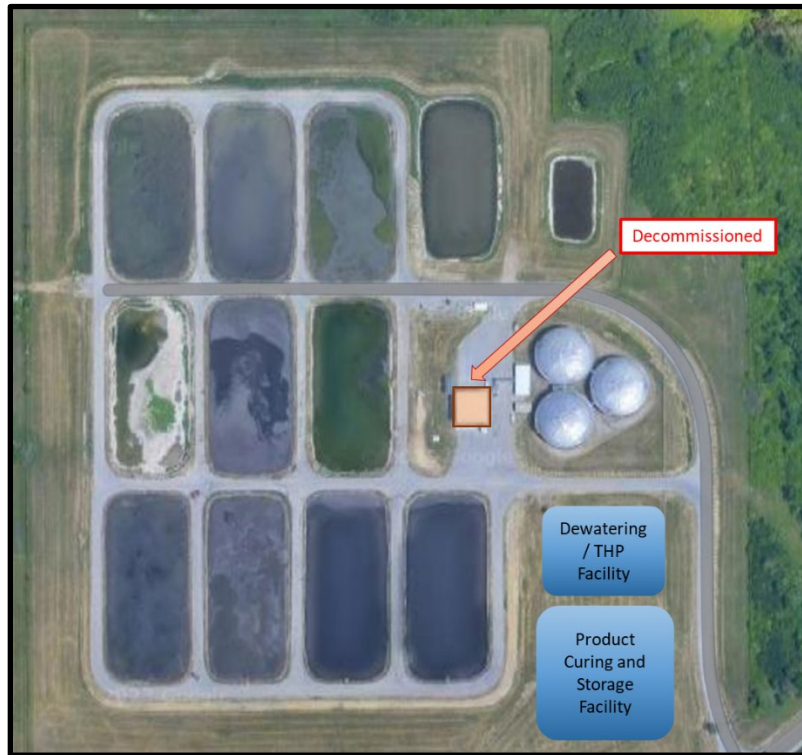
Strategy 3 – Garner Road Facility – Conceptual Site Plan
